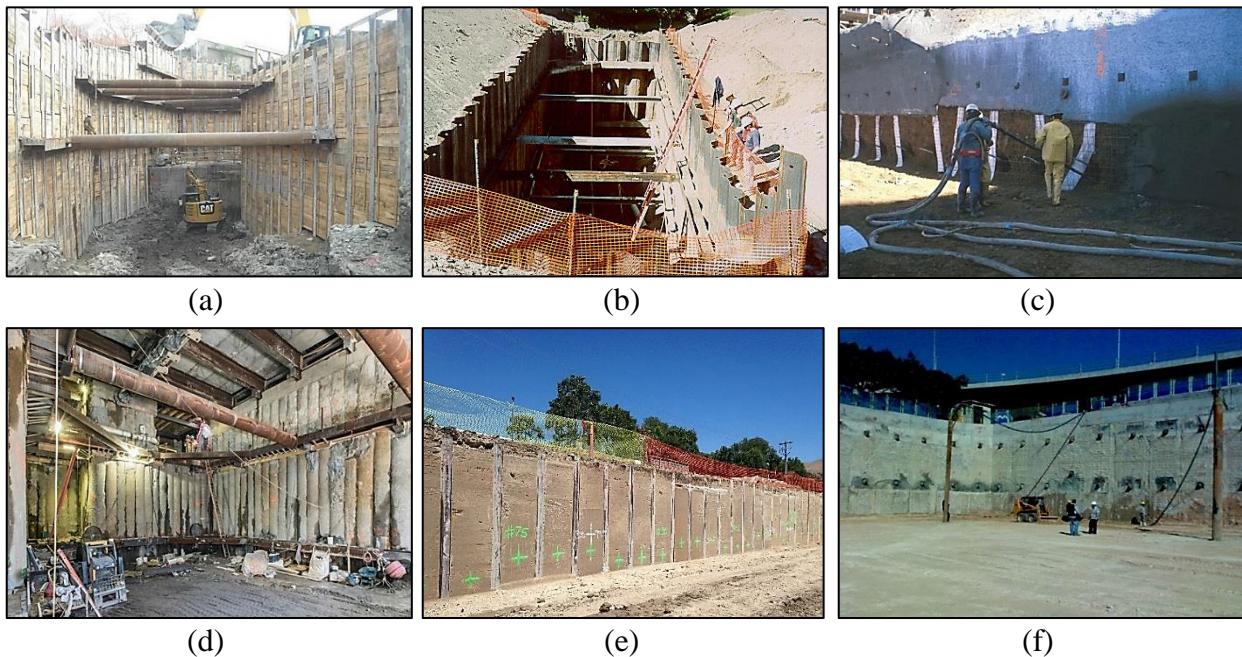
Different types of AER systems: (a) cantilever wall (height  $\leq 3.7$  m (12 ft)), (b) internal raker bracing, (c) cross-lot bracing, (d) anchored wall, and (e) soil nail wall ([a-d] after Tanyu et al, 2008; [e] after Lazarte et al, 2015)
